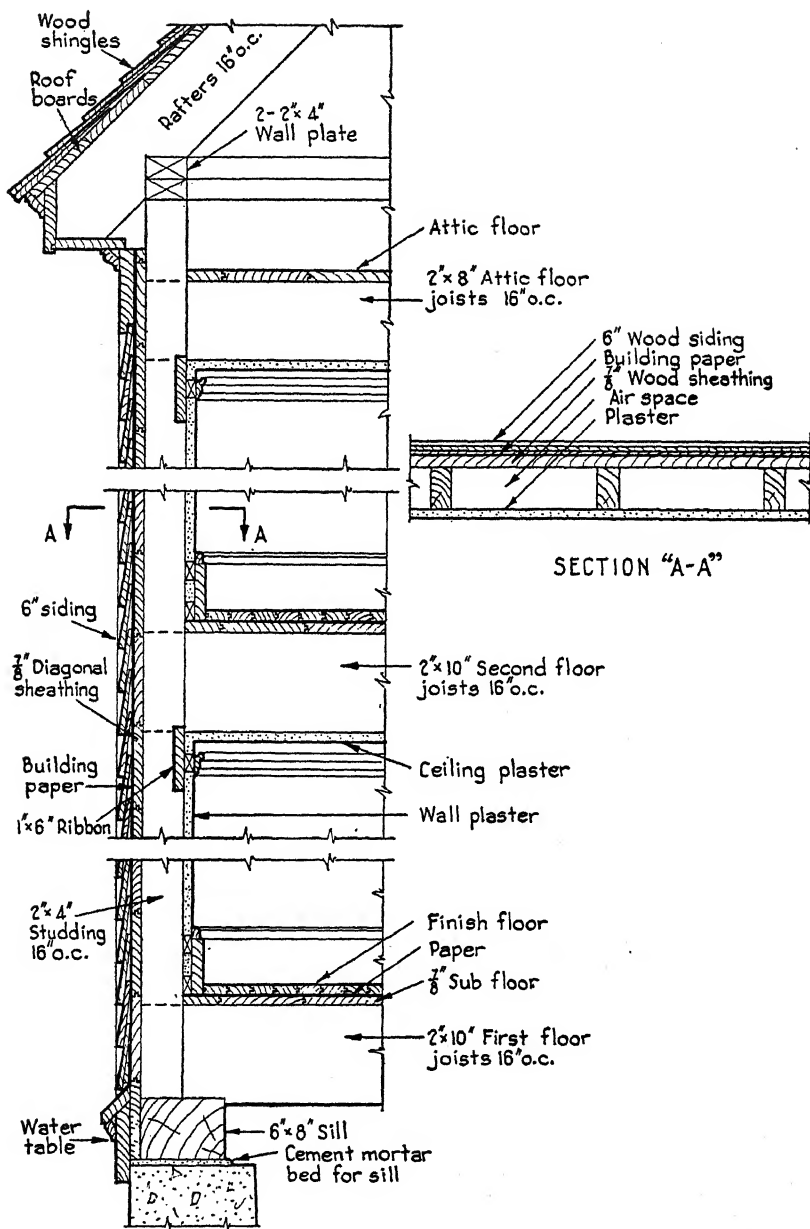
CROSS-SECTION, TYPICAL AMERICAN HOUSE CONSTRUCTION
